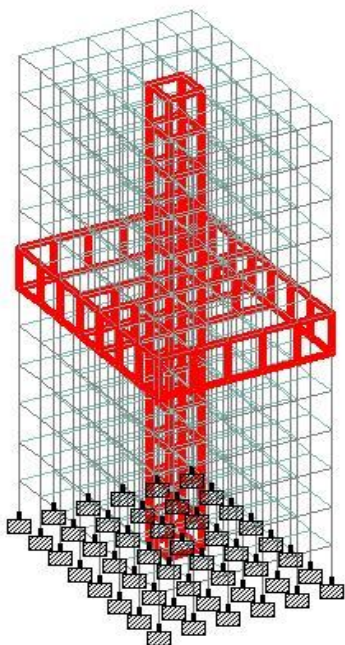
3D view of case (RA4) Residential Apartment with Shear core outrigger and wall belt supported system
